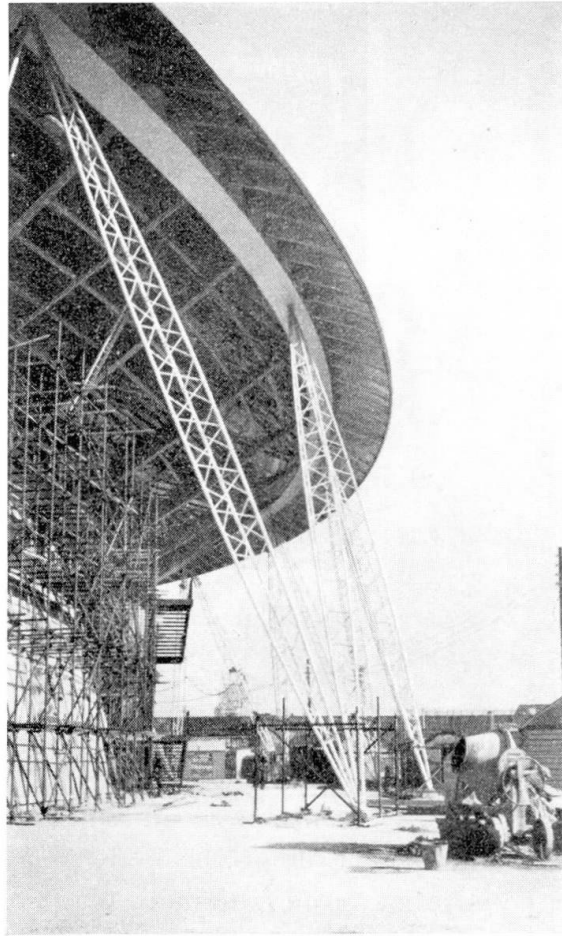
Apron framing from underside. Struts, Canopy, etc. complete, 4/10/50
